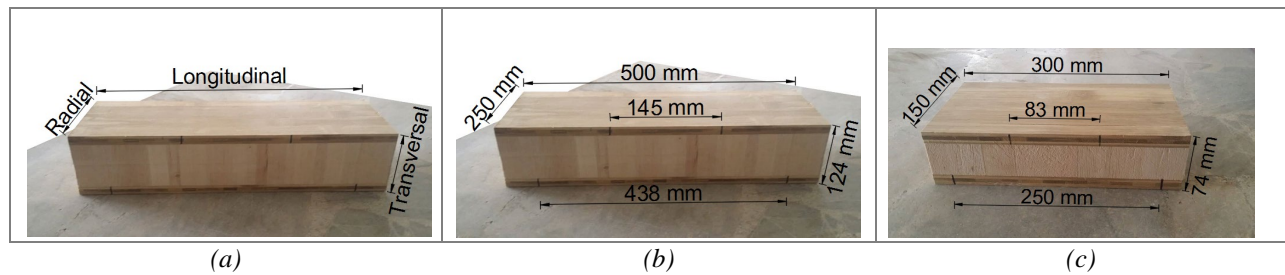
Bio-composite sandwich panel-samples for bending tests, a) loading directions, b) nominal panel-sample from prototype 1, and c) nominal panel-sample from prototype 2.
